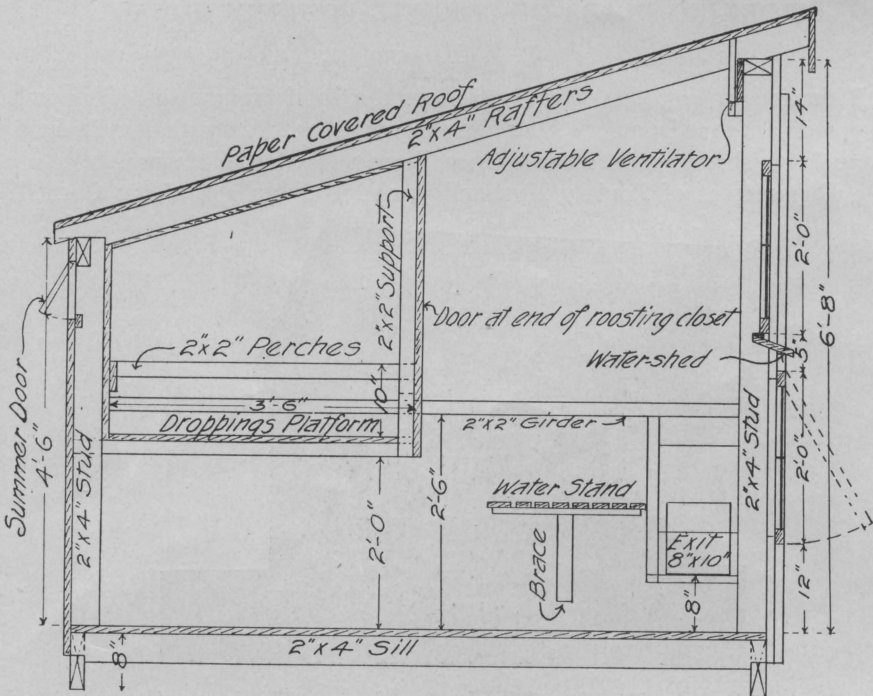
A cross-section plan of the Cornell breed-testing house. Note the construction of the windows, water-shed, and ventilating doors in the back and front walls
